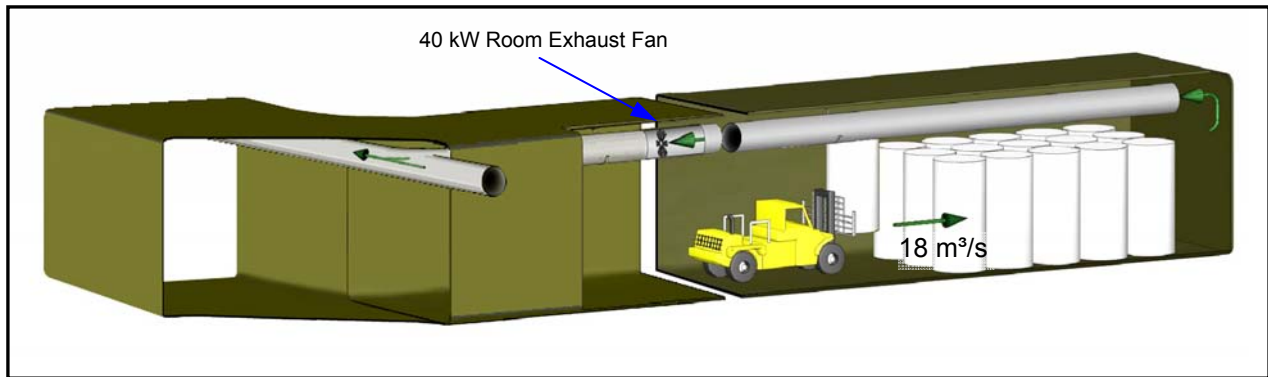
Active Emplacement Room – Typical ILW and Heavy LLW
